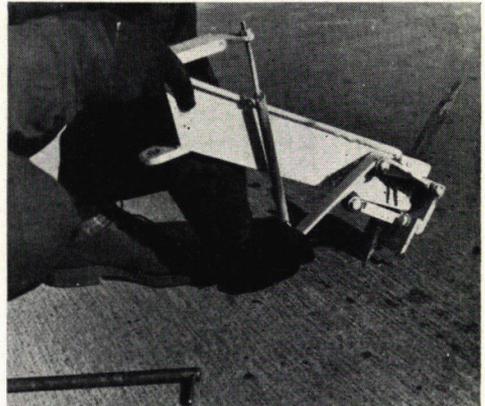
Close-up of rooter tool and spring-mounted surface scraper.
